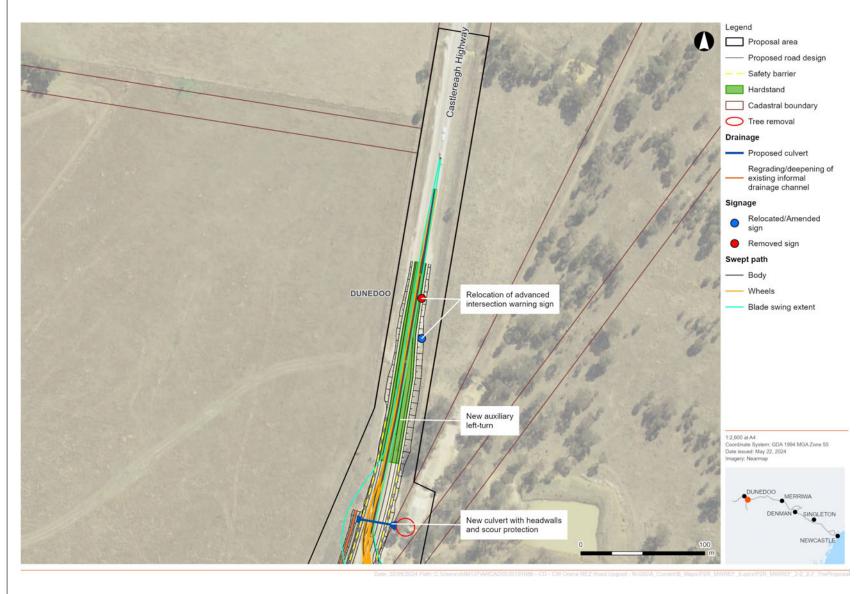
The proposal - Castlereagh Highway and Barneys Reef Road intersection (I-041), Dunedoo (Figure 1 of 2)
